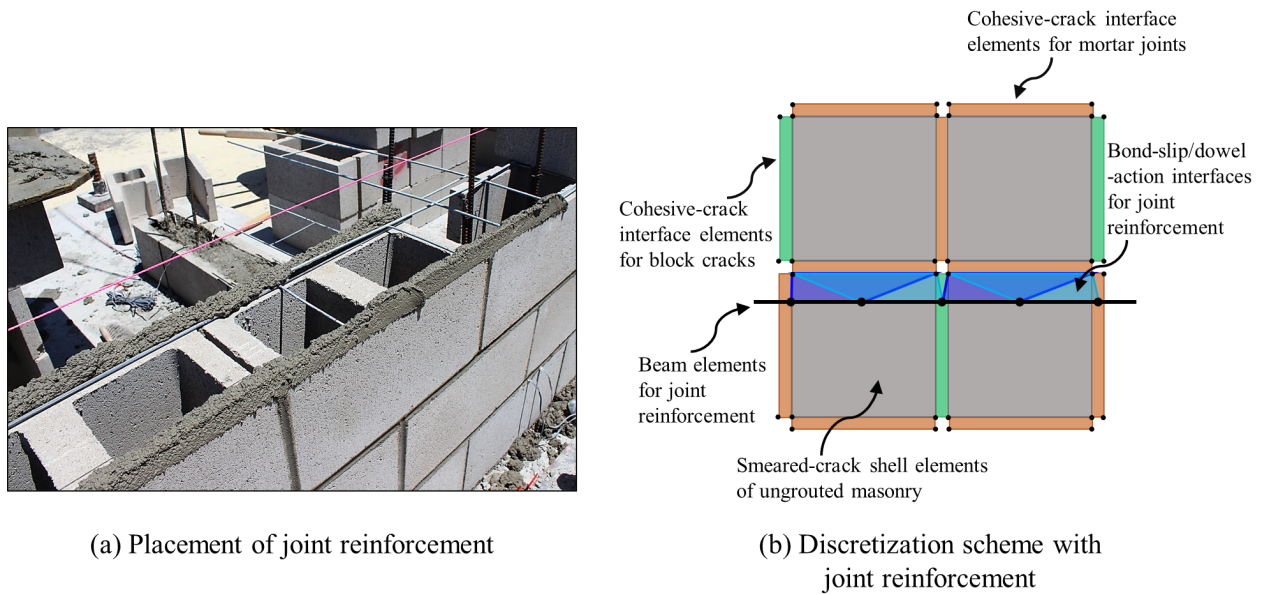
Placement of joint reinforcement in construction and in the numerical model.
